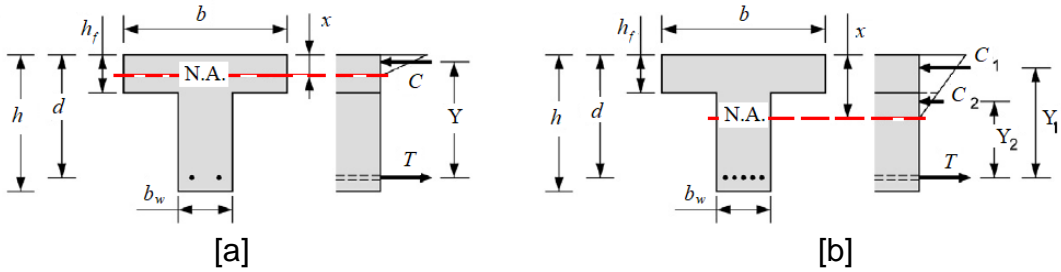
Scheme of cracking in a beam with T section ( $x \leq h_f$ ). [2].
